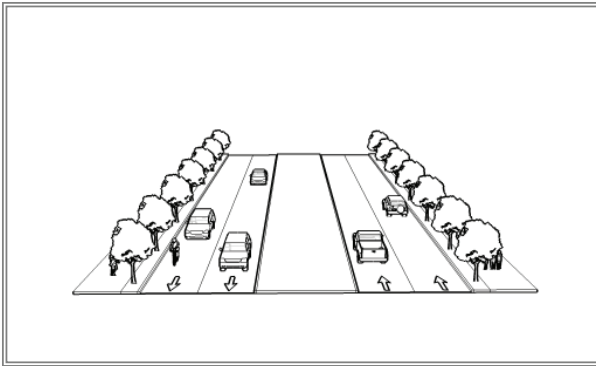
AASHTO recommended placement of trees between sidewalk and travel lanes.
